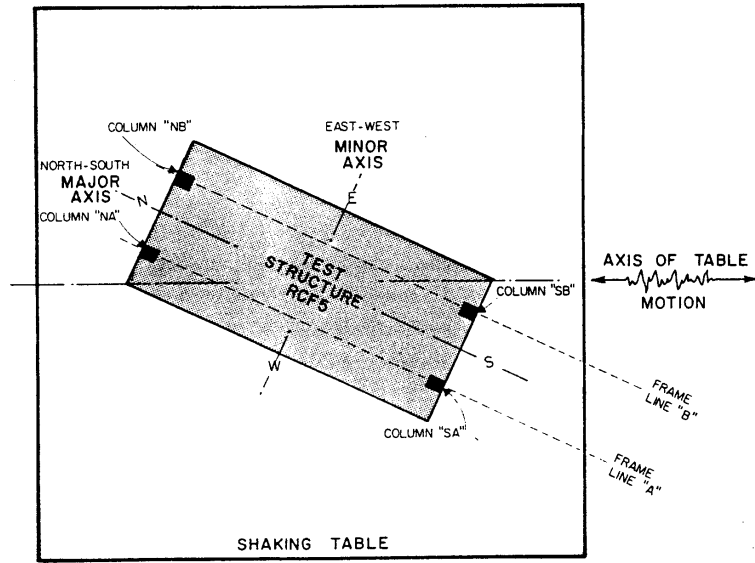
Plan and elevation of 1/3 scale 2-story frame [Oliva, 1980]
